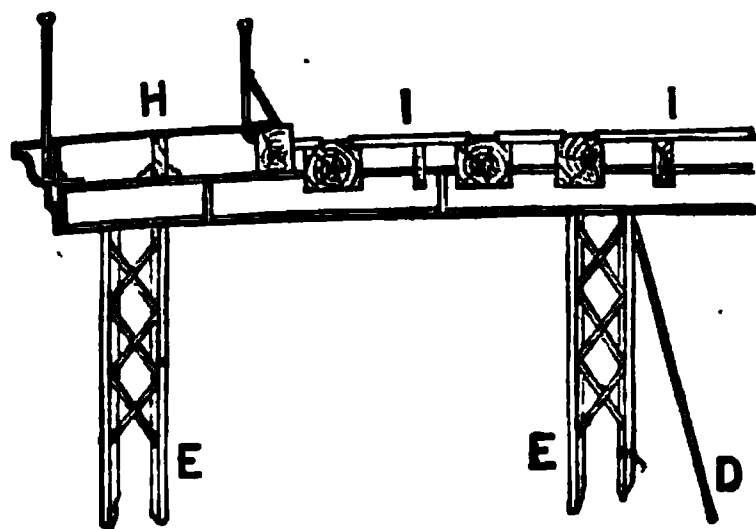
Shows a cross-section of a portion of the upper roadway.
